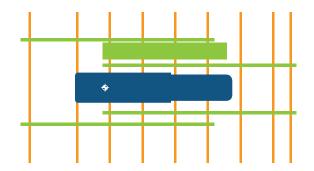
Imaging suite ceiling level strut channel and medical equipment support rail schematic
